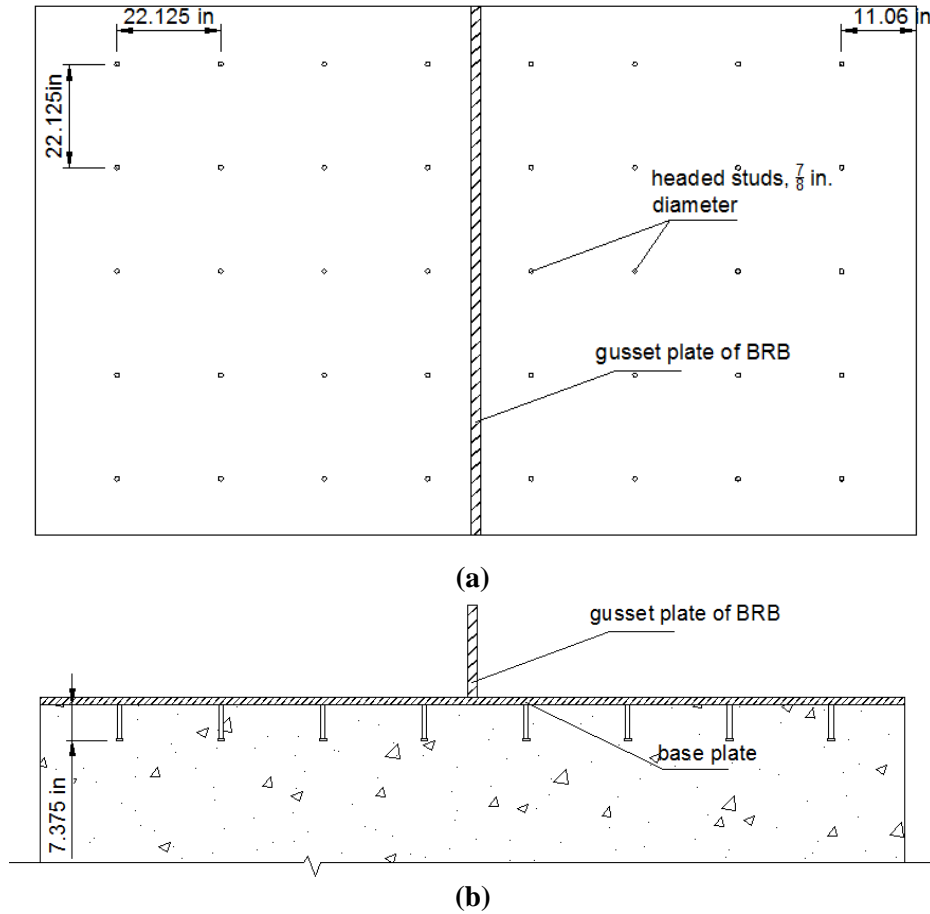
(a) Top view of BRB gusset plate connected with foundation (b) Side view
